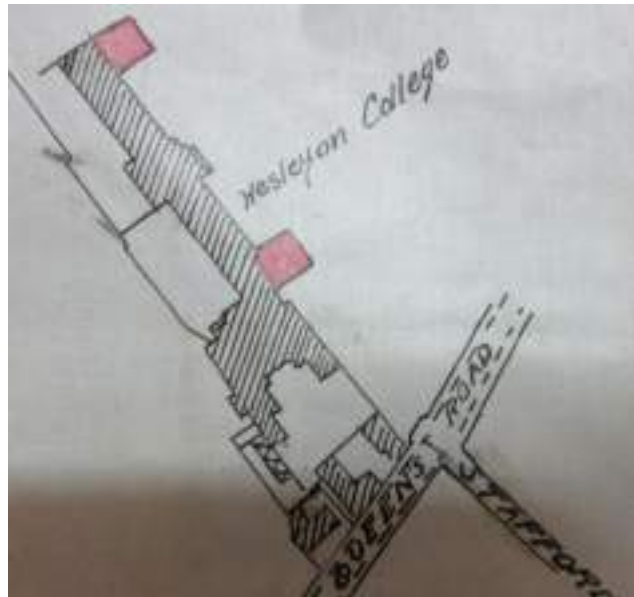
Block plan showing north and south wings, both of which acquired a new storey, 1903.
